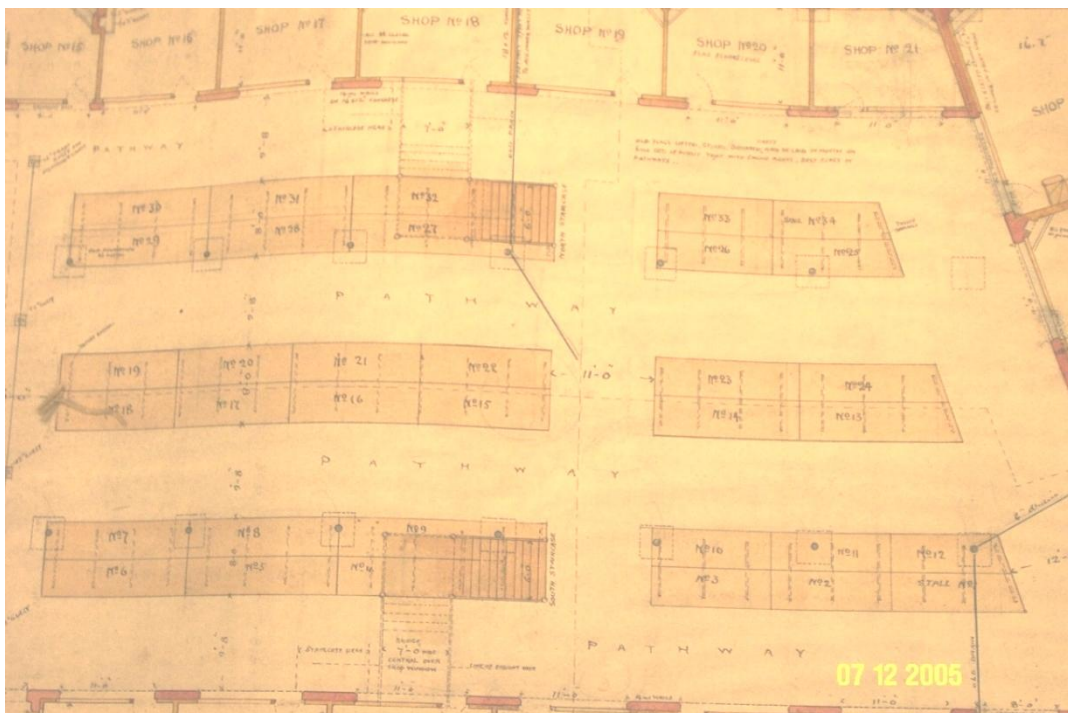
Showing the original architect's plan of the interior of the second market hall. Note the more substantial structures relating to the exterior shop units. Note also the possible pillar and wall (above centre right) which may relate to structure [1222] recovered during the watching brief.
